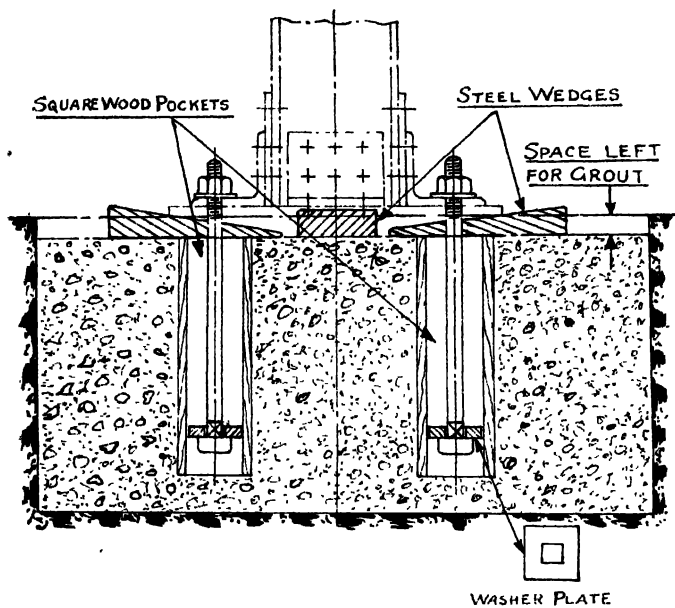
CONCRETE LEFT LOW FOR GROUTING
